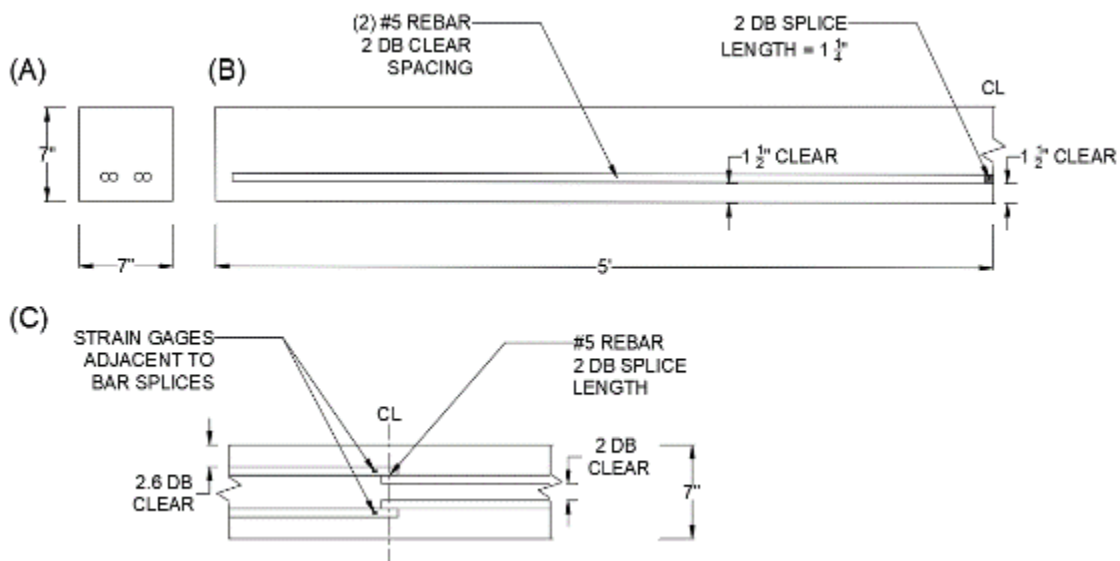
Section (A), profile (B), and plan (C) views of typical splice beam design with No. 5 reinforcing bars
